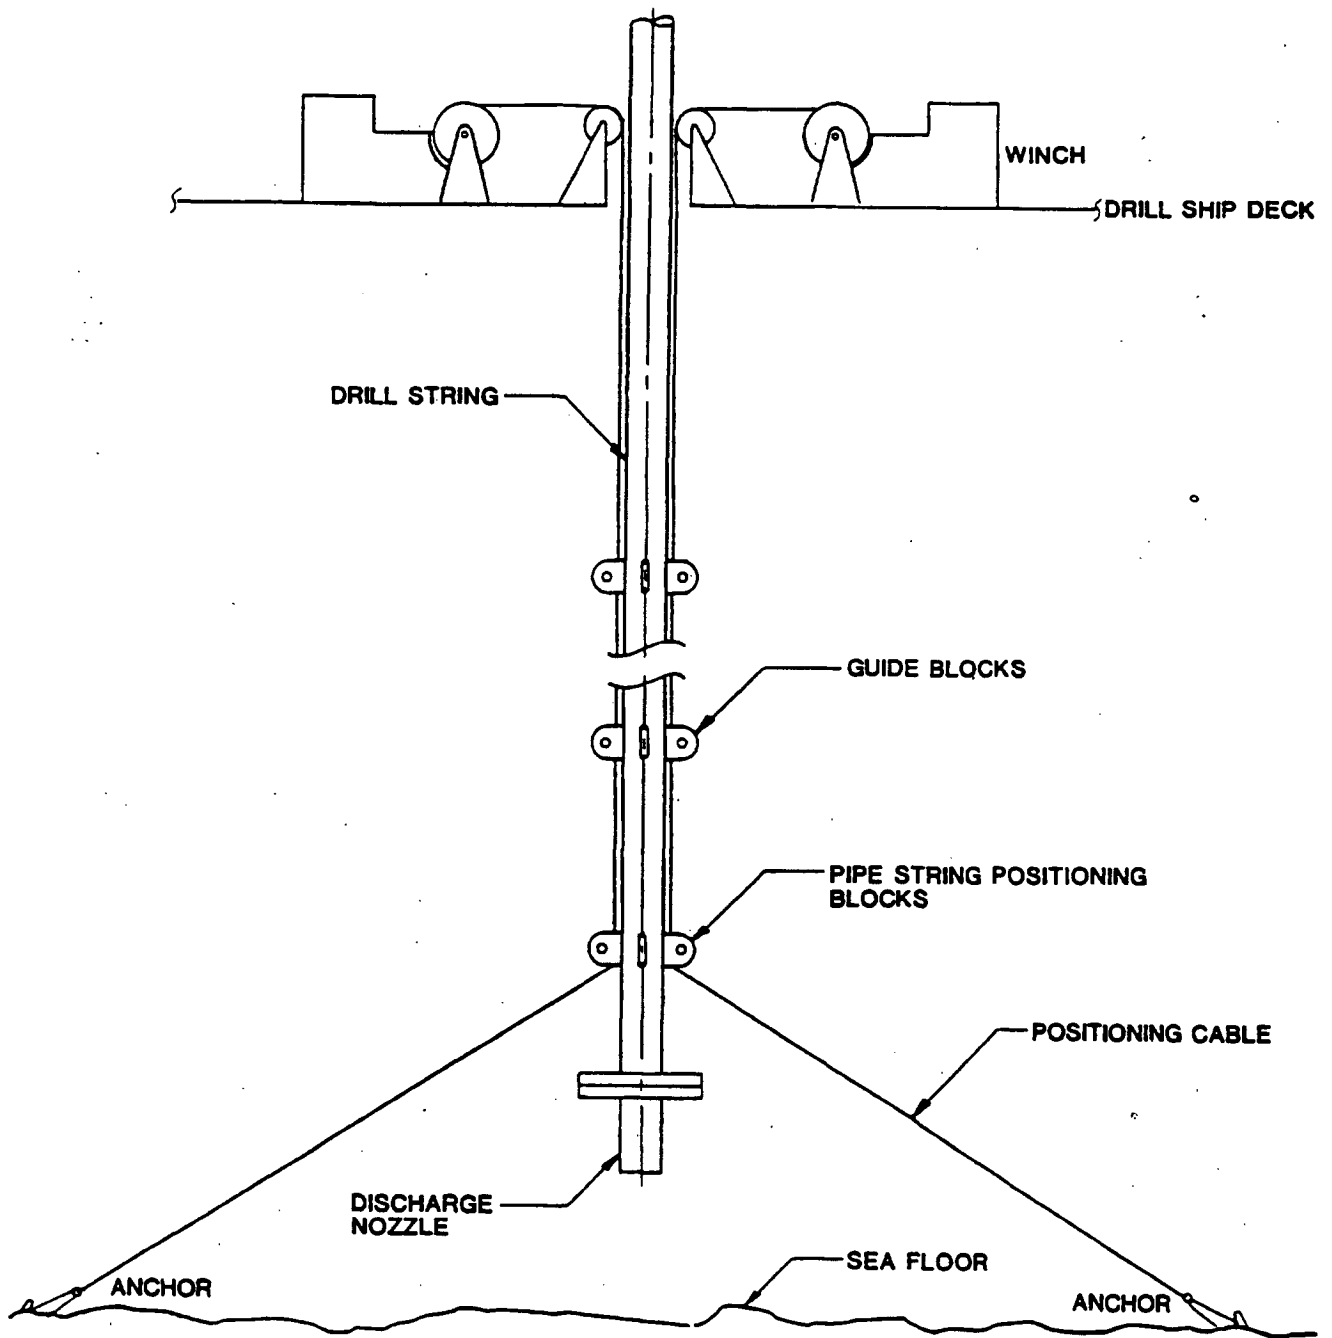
Drill String Tip Positioning Using Anchors, Cables, Guide Blocks, and Winches Controlled by Positioning System
